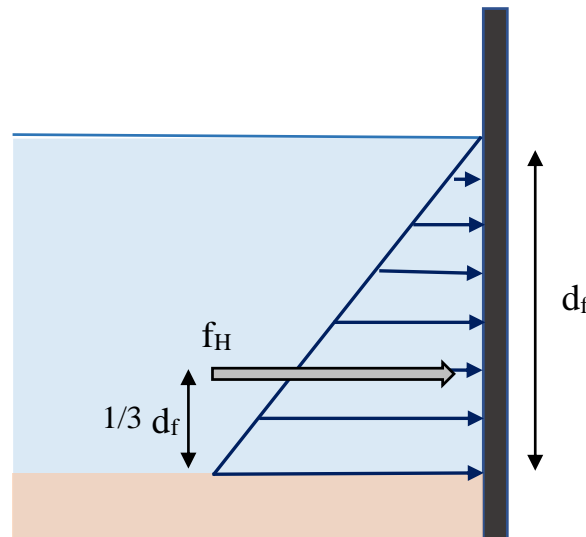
Hydrostatic pressures and force on a vertical wall
